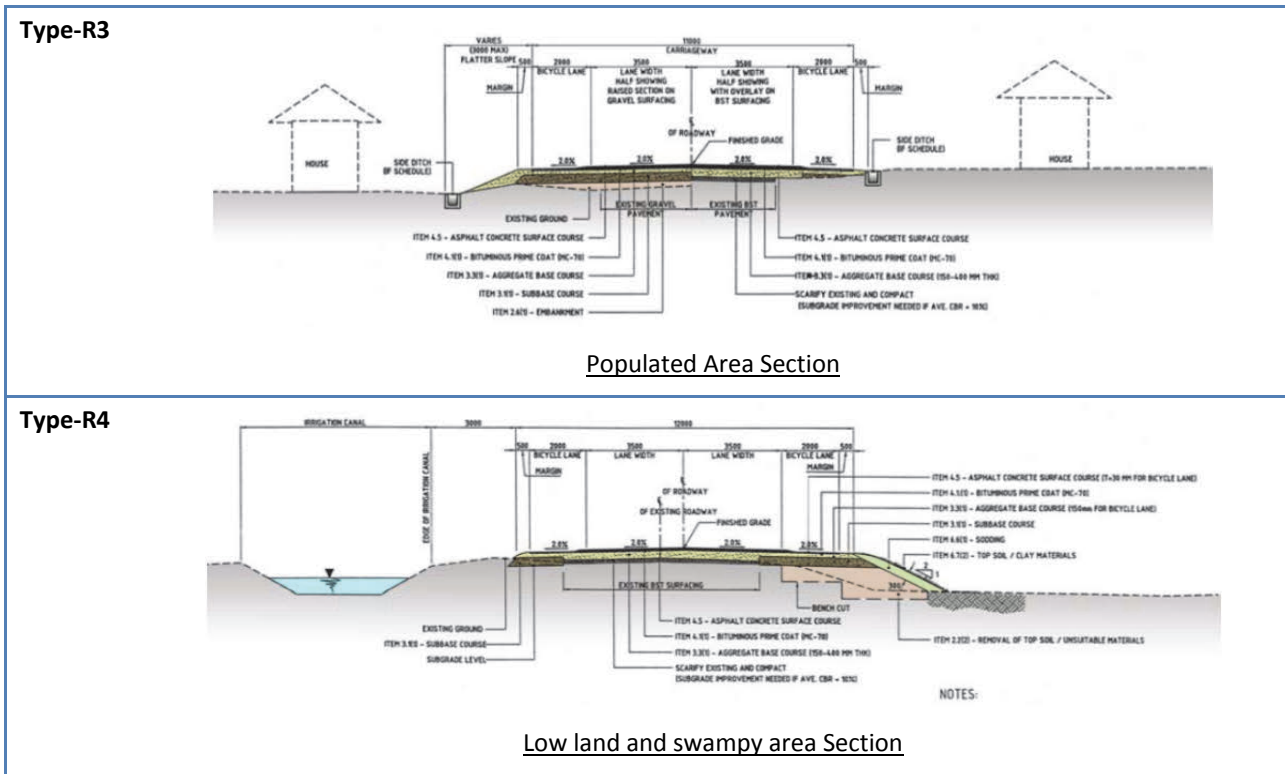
Standard Cross Sections for Road Improvement Plans
